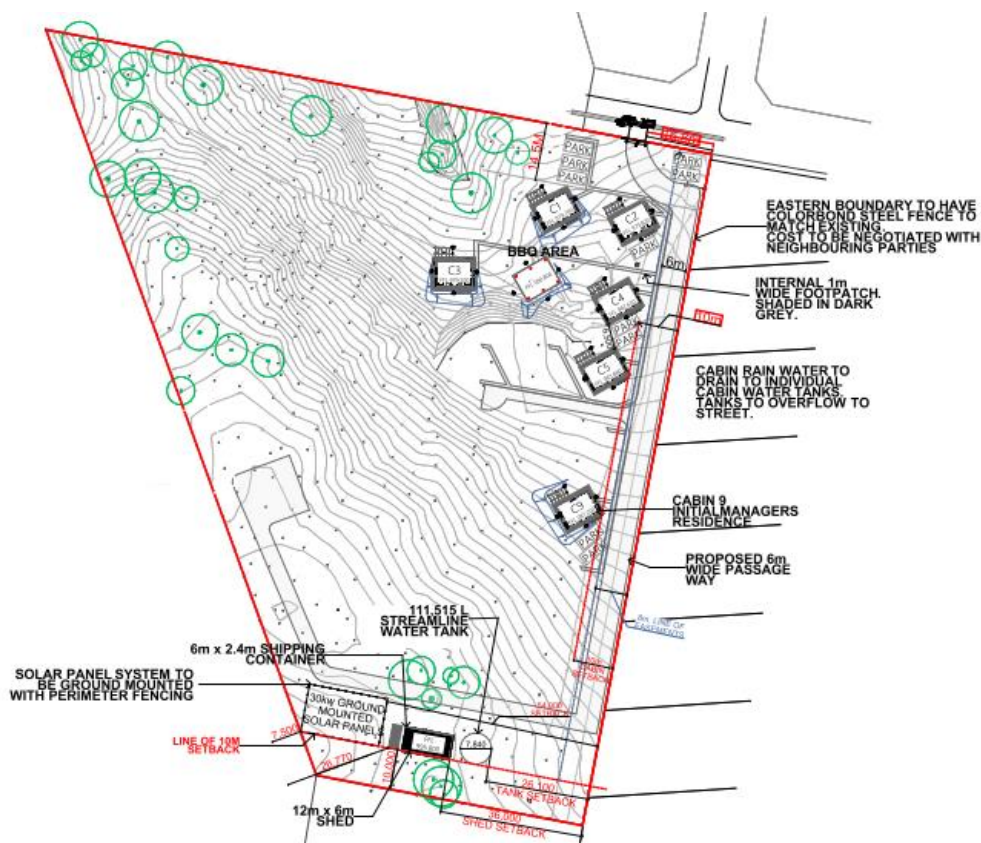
Proposed Site layout – Stage 3 Cabins 4 & 5
